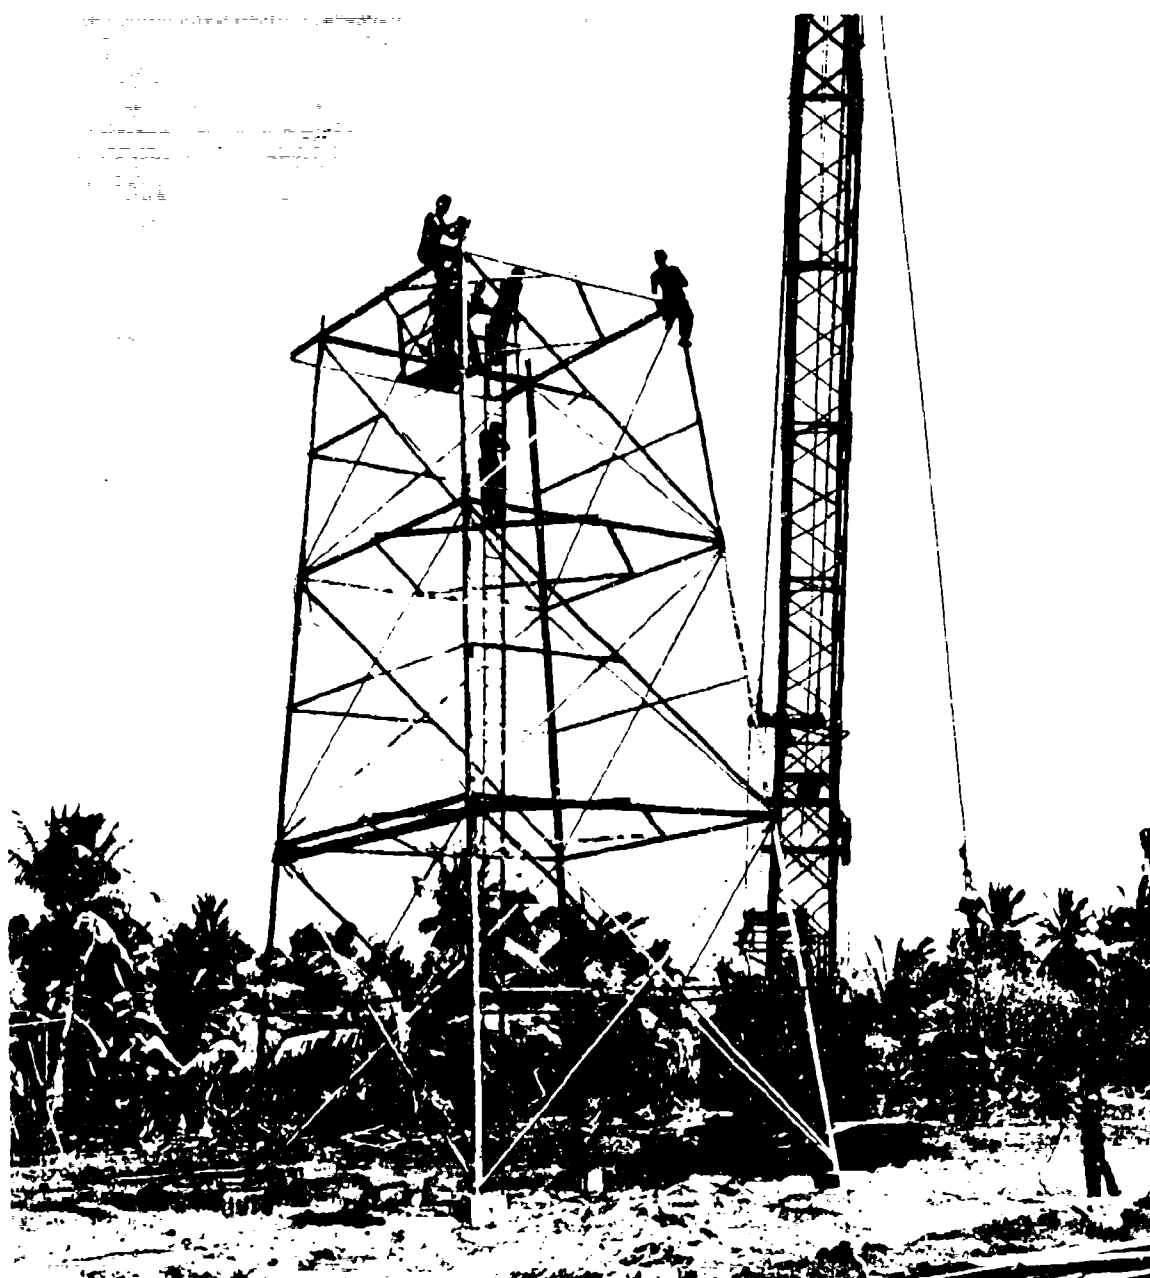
Erection of photo towers on Bikini, prior to CROSSROADS, 1946.
